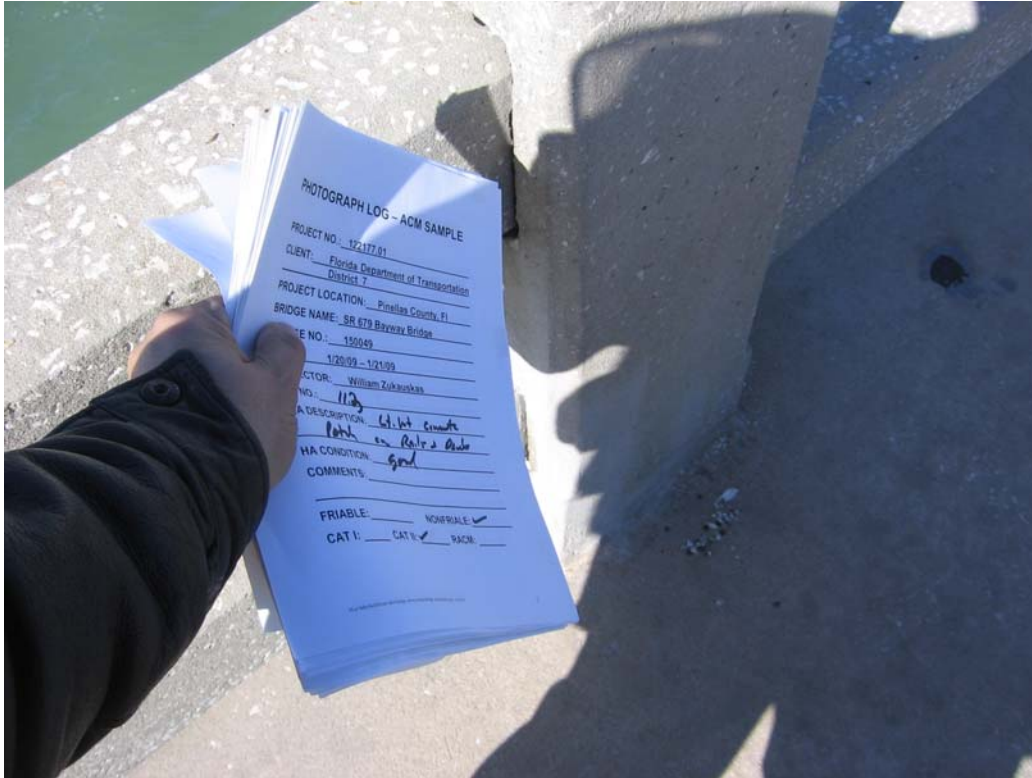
01/21/09 – SAMPLE 11.3 – HA 11
